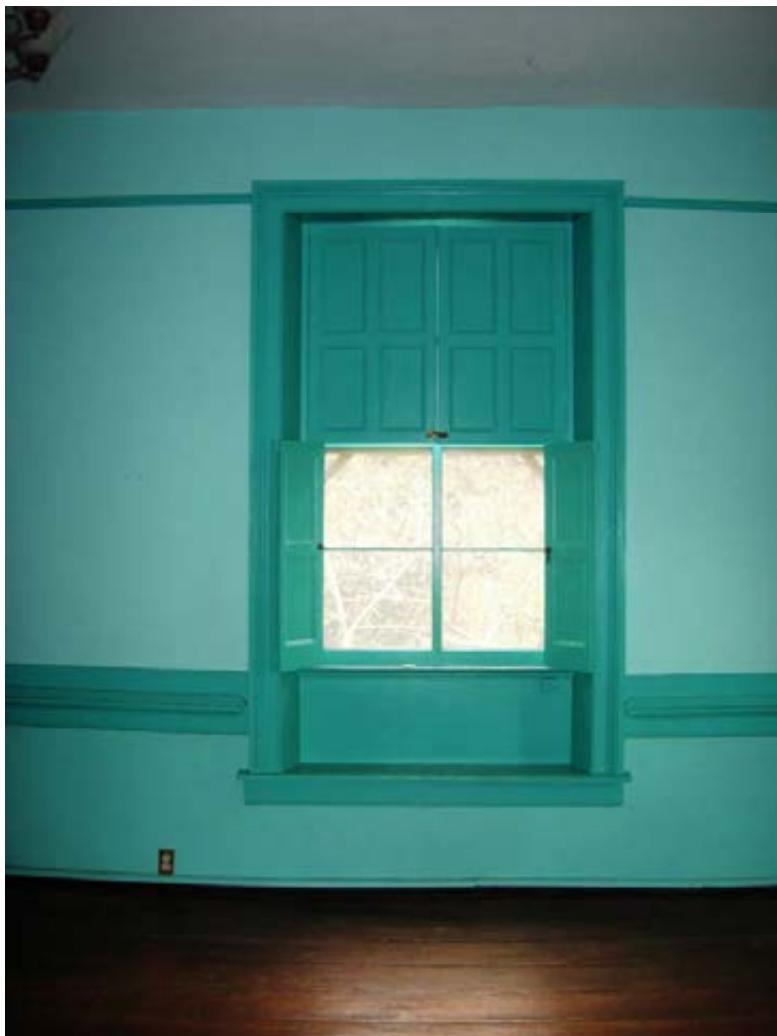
Window on the east wall of the southeast bedroom. Photograph by Kathleen Manicke.
